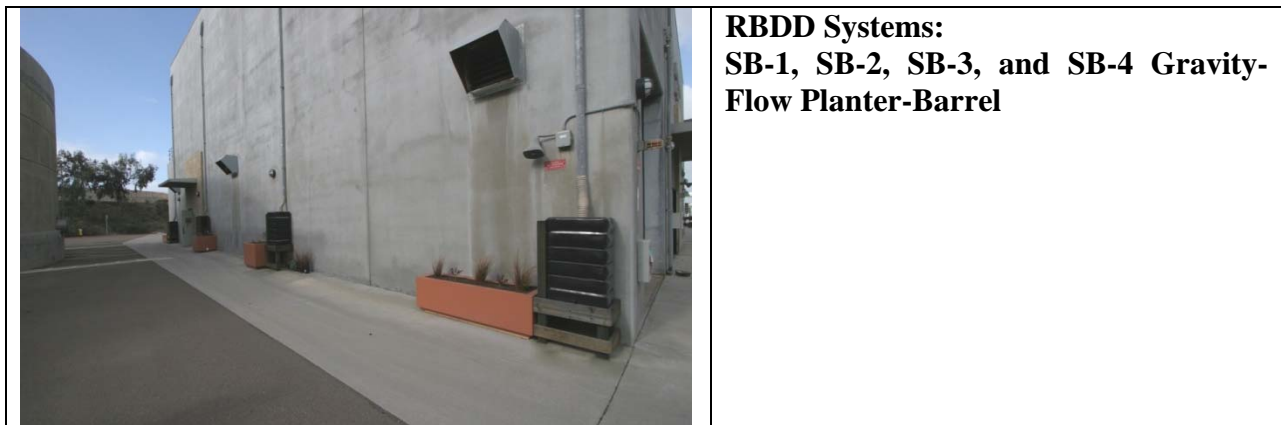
South Bay Wastewater Treatment Plant Downspout Disconnect Installation Photograph(s)
